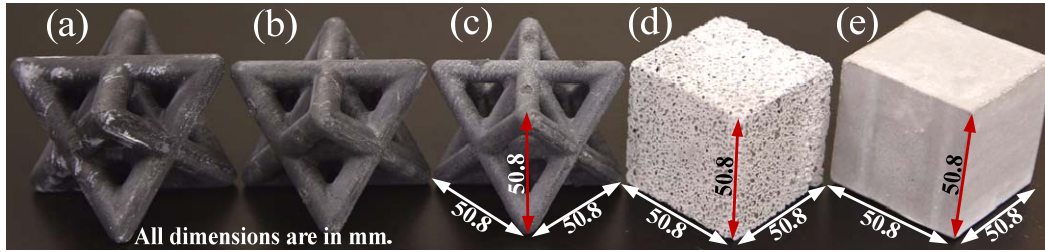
50.8-mm side-length UHP-FRC OTEC unit cell material specimens with (a) 11, (b) 10, and (c) 8 mm-diameter elements and (d) 50.8-mm foam G-UHPC cube and (e) 50.8-mm solid G-UHP-FRC cube material specimens before testing under uniaxial compression.
